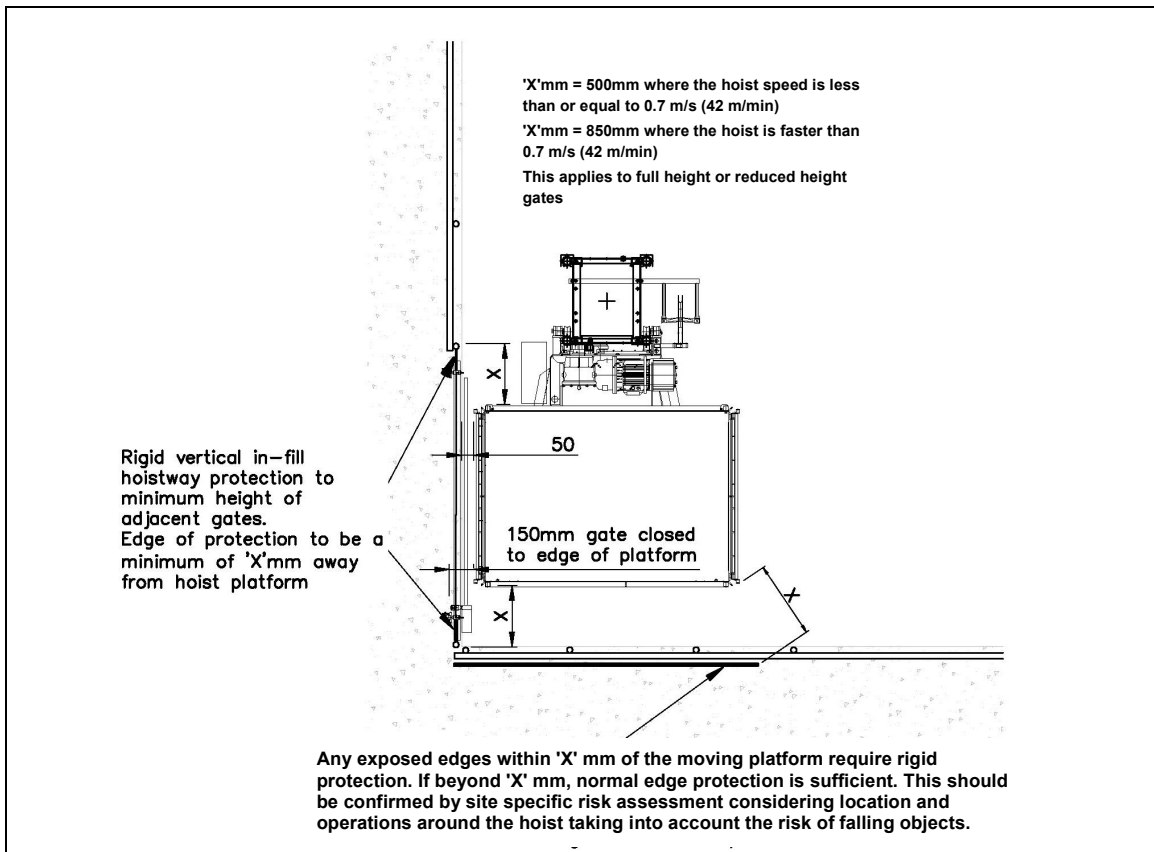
Typical Goods Hoist Landing Detail & Hoistway Protection with Full Height Gates
